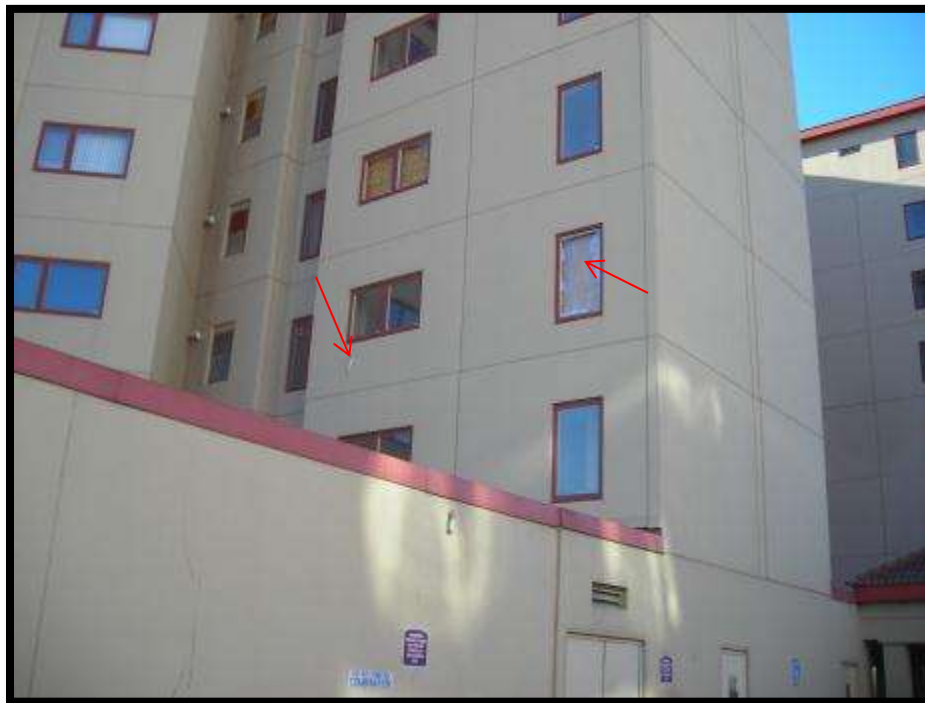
Gouge in EIFS wall (East elevation, 3rd floor level).
